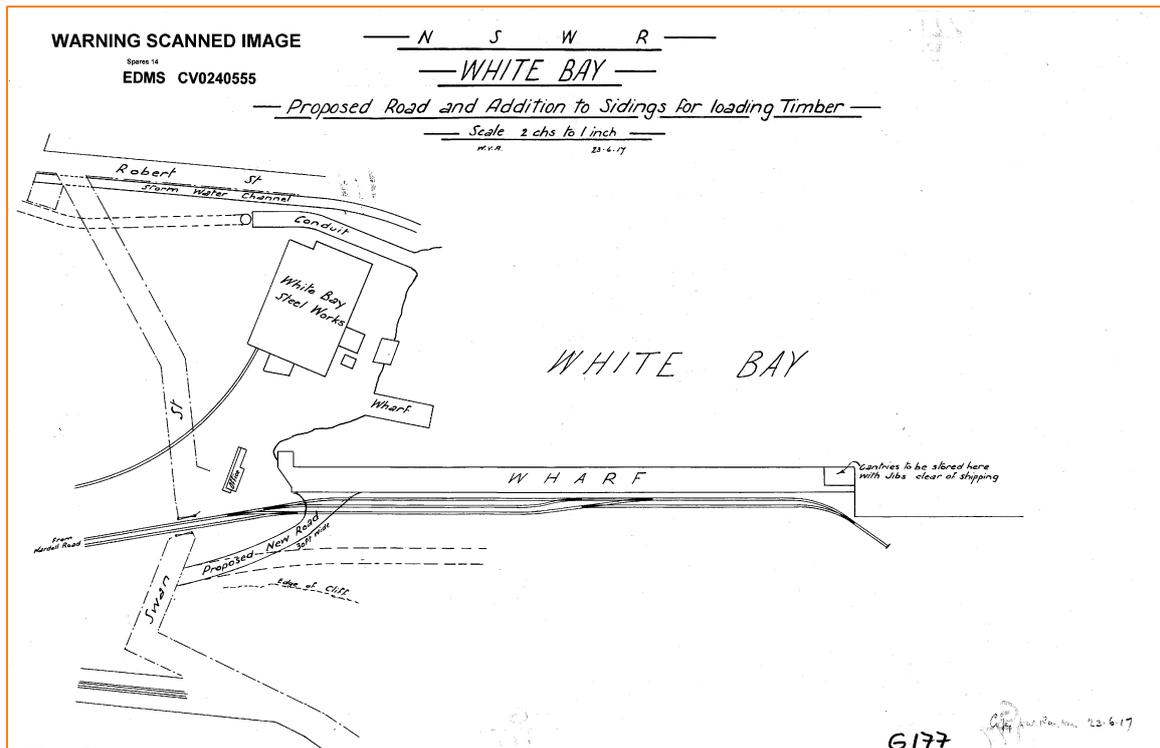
‘NSWR – White Bay – Proposed Road and Addition to Sidings for loading Timber’, dated 23 June 1917, showing the White Bay Steel Works at top left, with an ‘Office’ noted at the western end of the Glebe Island Wharf. Source: Transport for NSW Plan Room, 0240555
